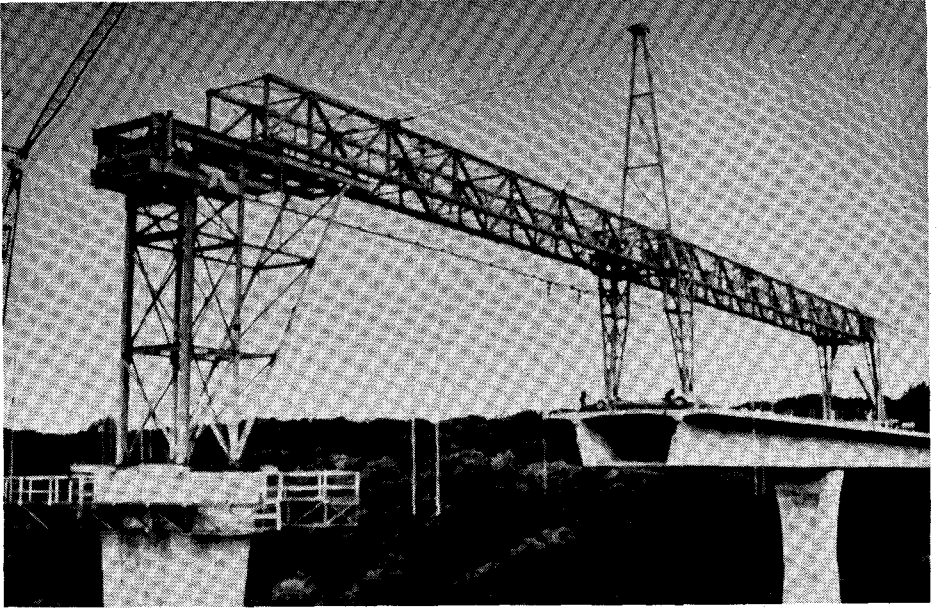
Launching truss about to be moved to new location. Note temporary steel tower on pier in foreground.
